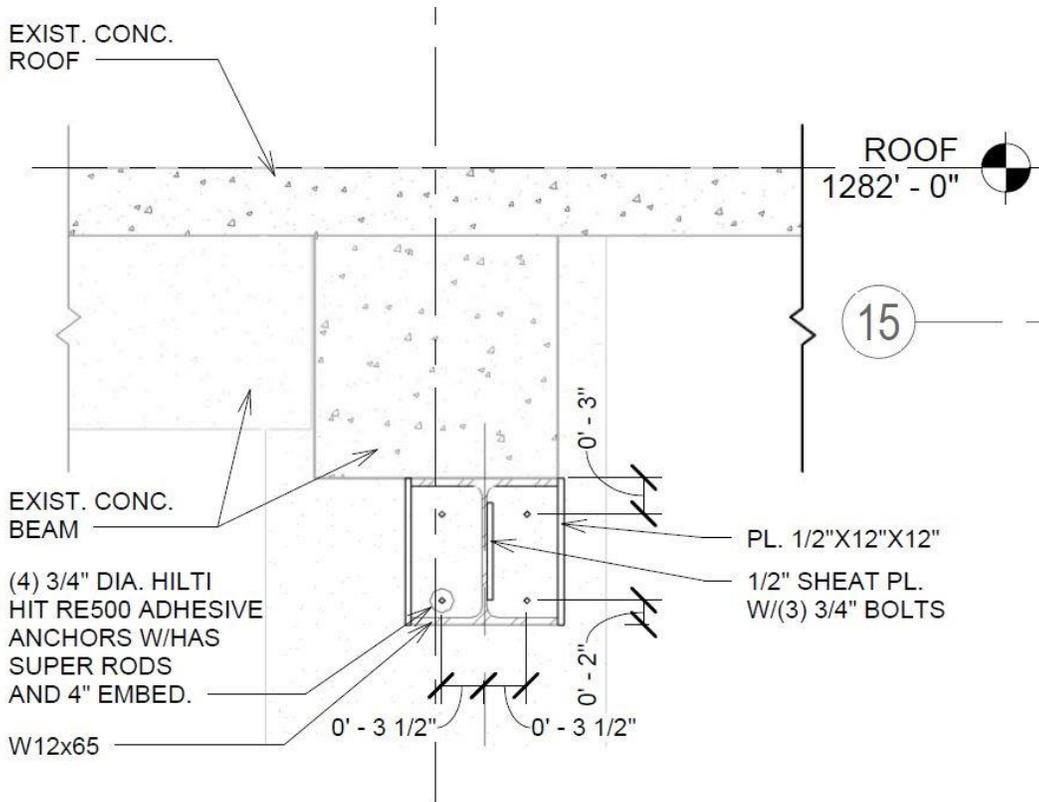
Section 12, detail of current roof reinforcement plan. (From project structural plans)
